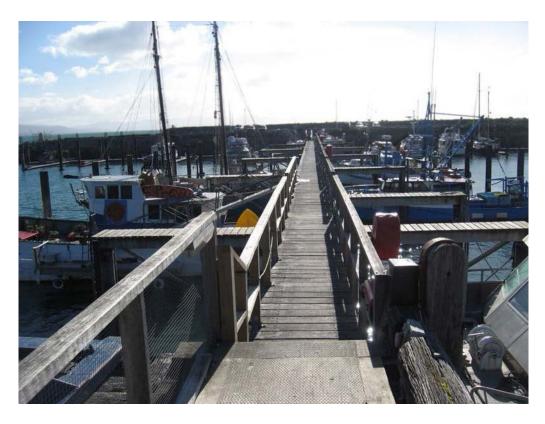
View of deck of timber wharf (condemned and retained for future development).
